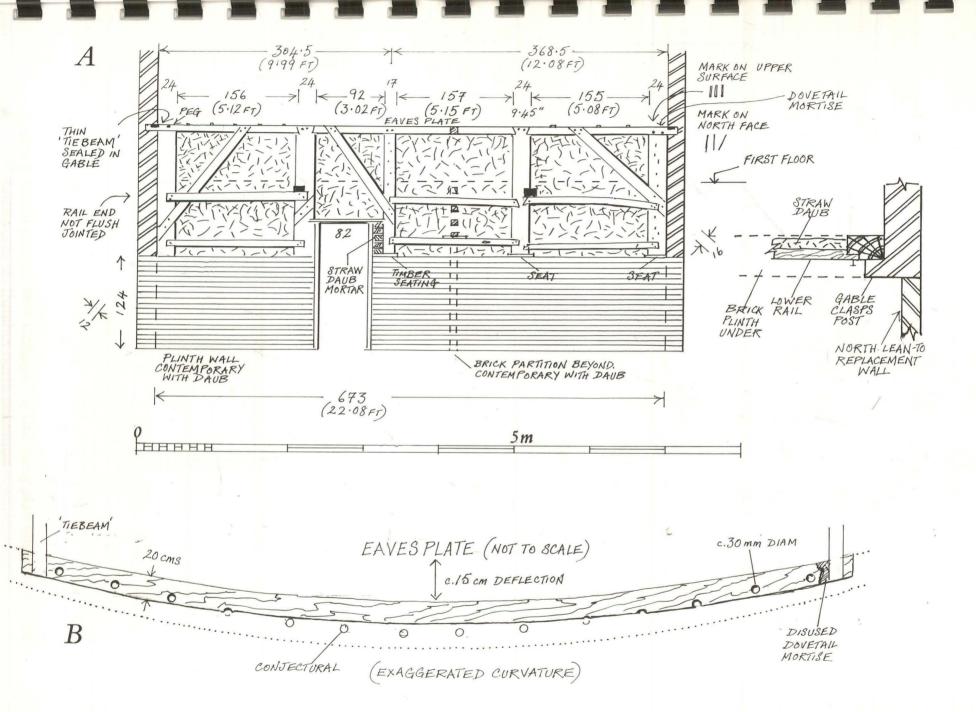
North Somercotes Cottage. a) Main north elevation b) Detail of eaves plate
